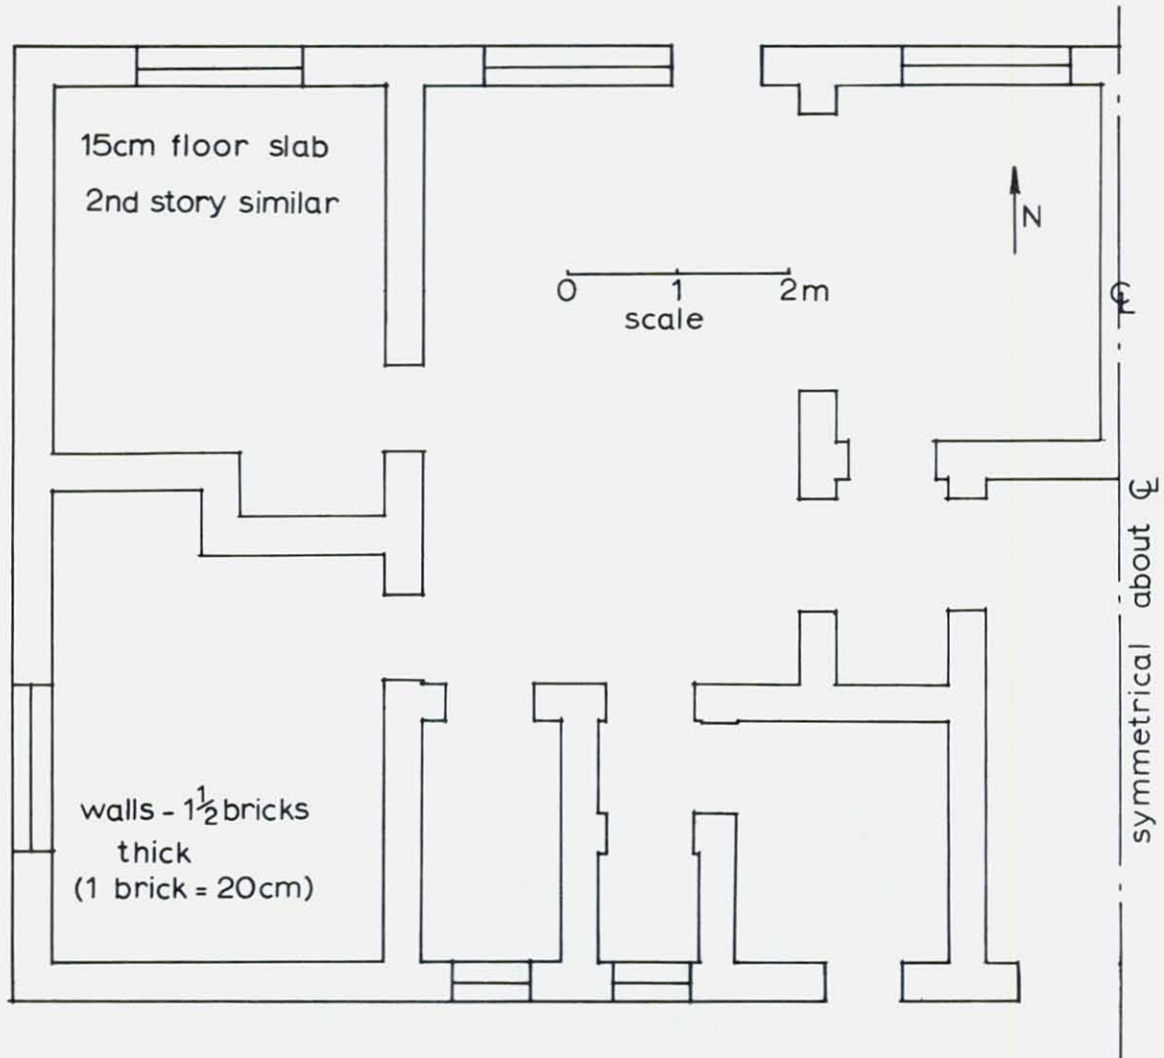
A floor plan of the shattered two-story apartment building shown in the previous figures. Note that openings occupy about 55% of the length of the north wall, greater than the 40% maximum prescribed in the Turkish code, and in the east-west direction, the lateral resistance provided by interior walls is scant.
